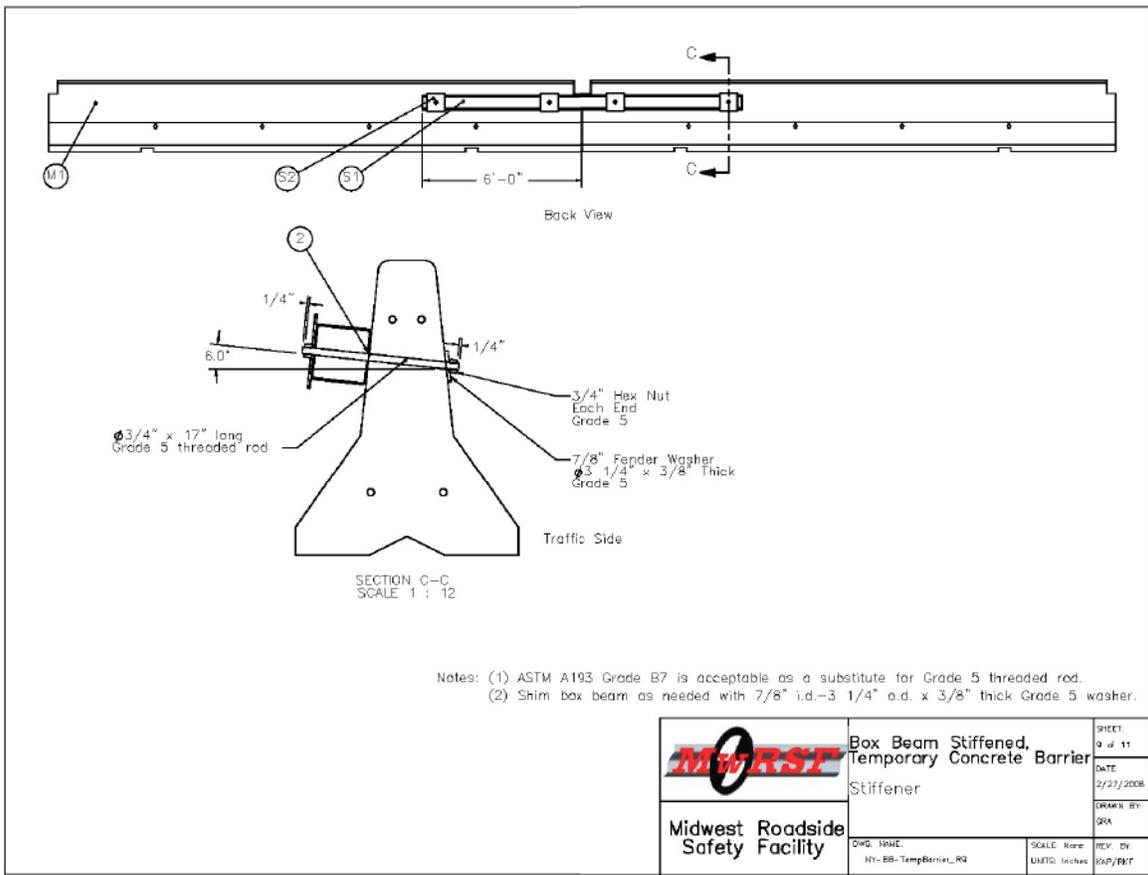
Box Beam Stiffener Details (English), Test NYTCB-1
